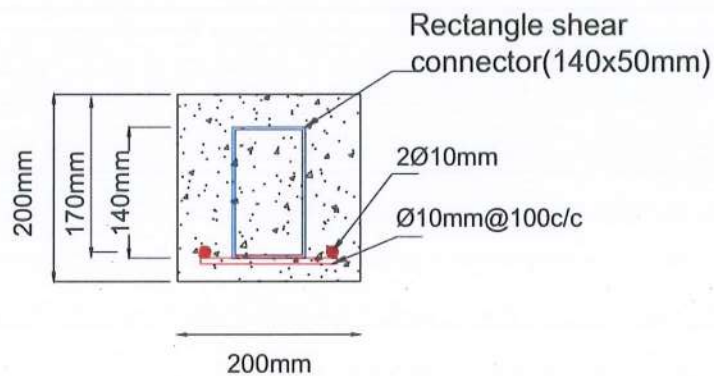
Cross-Section for Beam with Rectangle Shear Connector.
